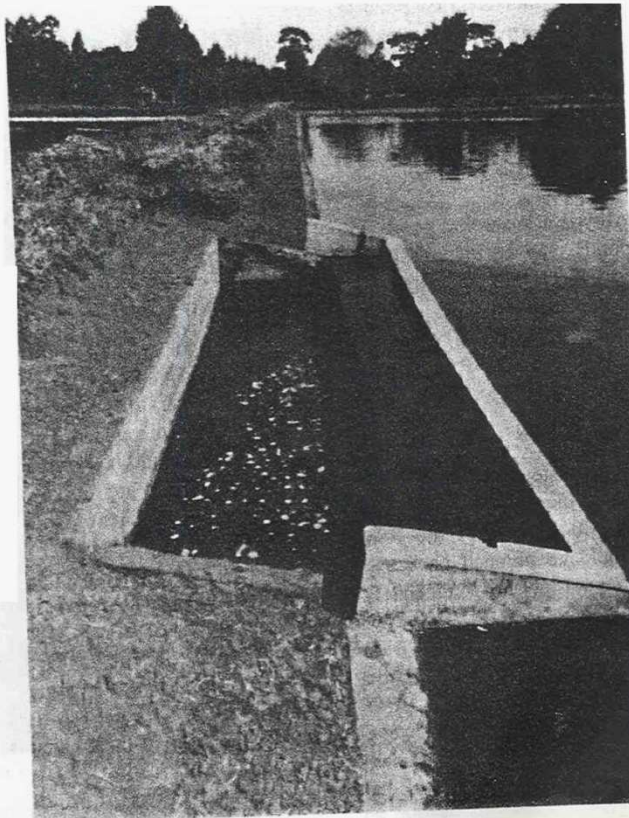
Outlet Weir structure at Karatina, Kenya
